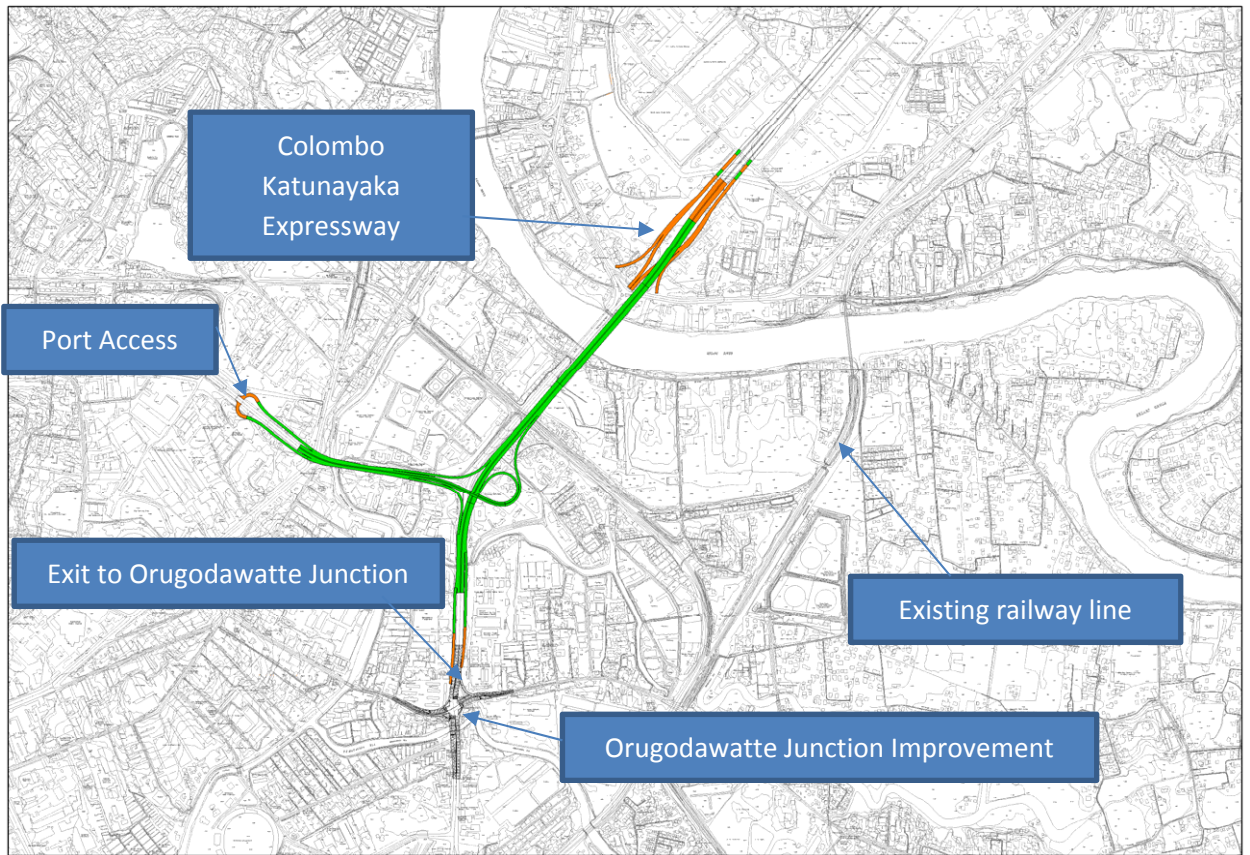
Alternative B: Adjacent to New Kalani Bridge
